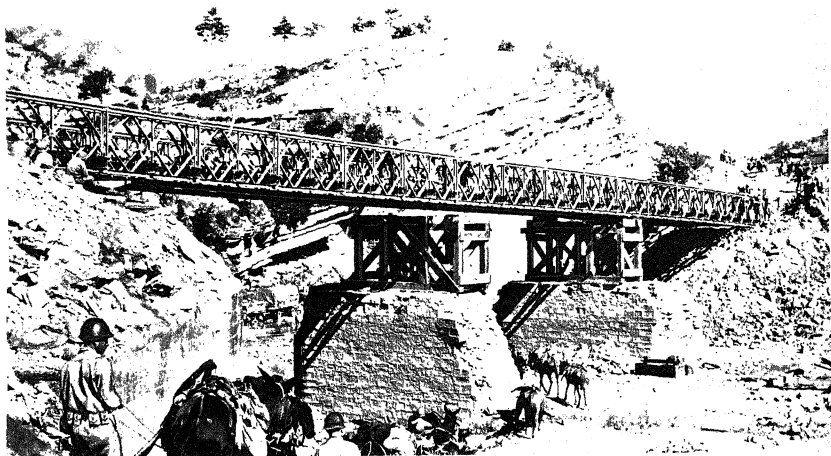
A 170-foot DS continuous panel bridge supported on timber piers. Near end of bridge is jacked up preparatory to inserting expedient bearings on near pier.
